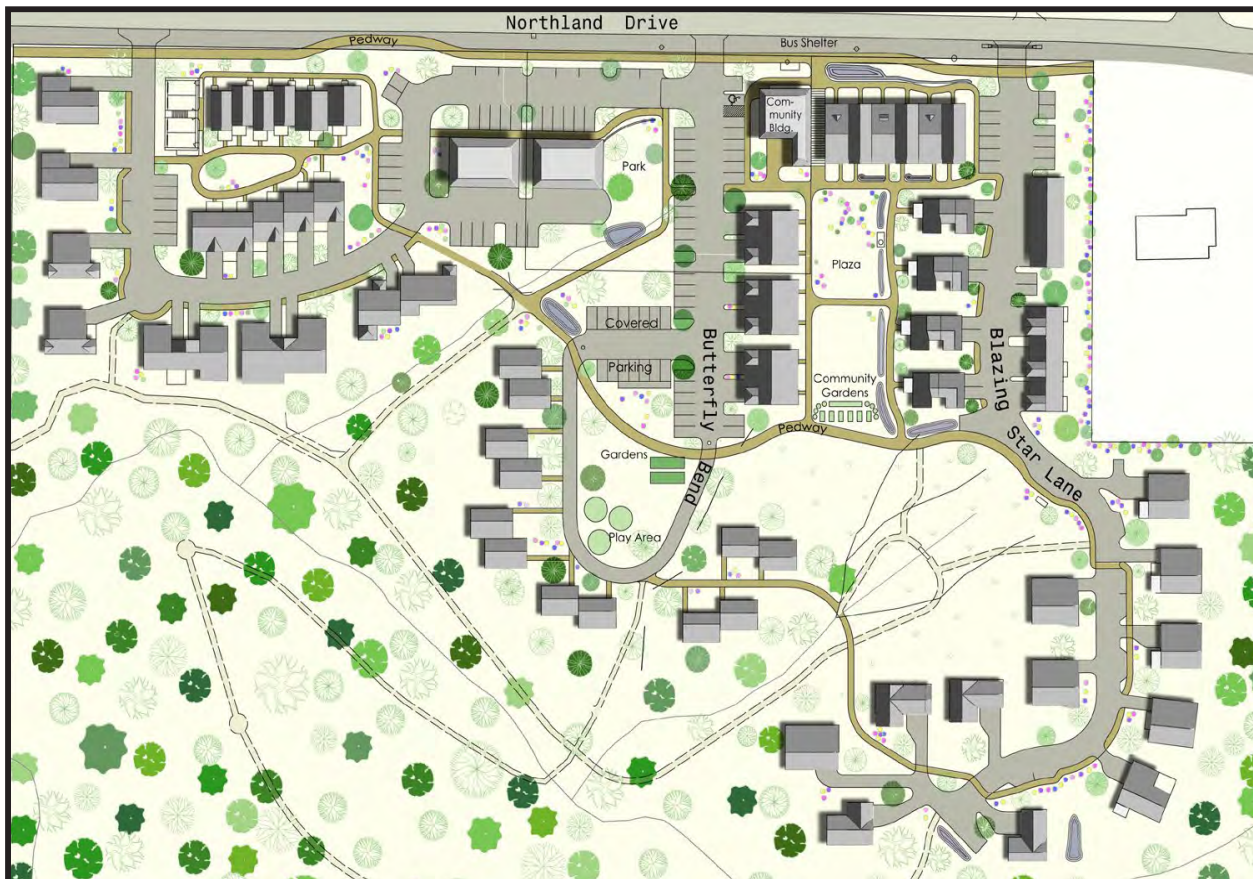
Bear Creek Prairie Proposed Development Site Plan. Source: Andy Gutti www.bearcreekprairie.com
